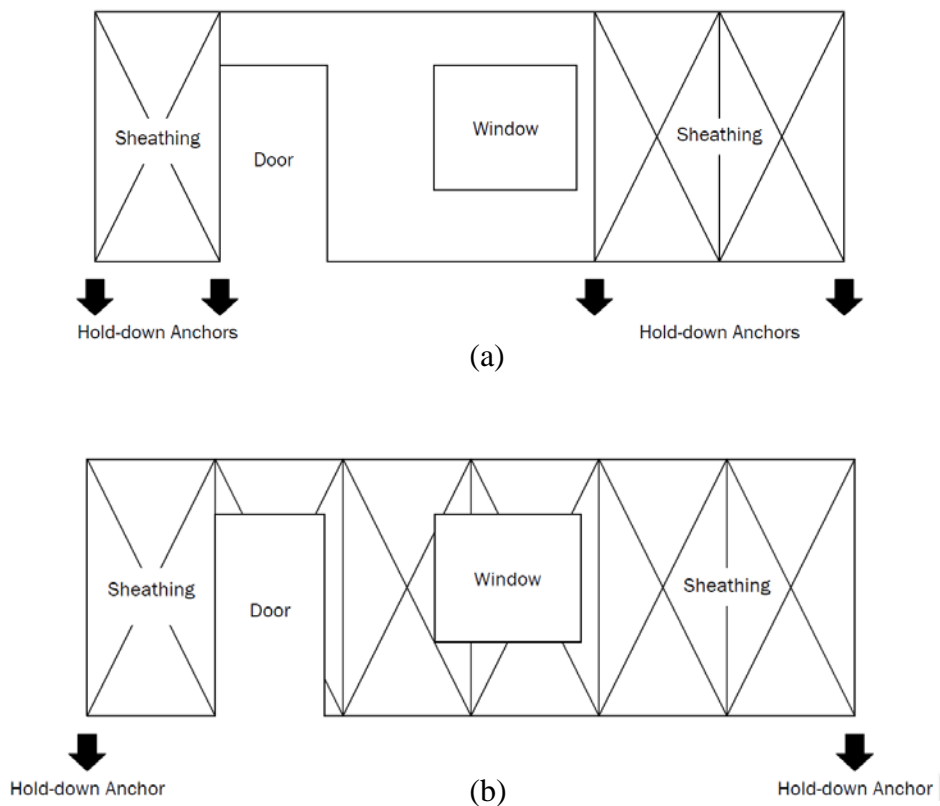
Classification of shear walls: (a) Typical *Type I* Shear Wall, (b) Typical *Type II* Shear Wall (AISI, 2007).
